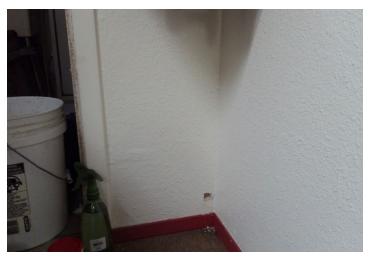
Sample A-1, Library, Corner BC, Wall Material
